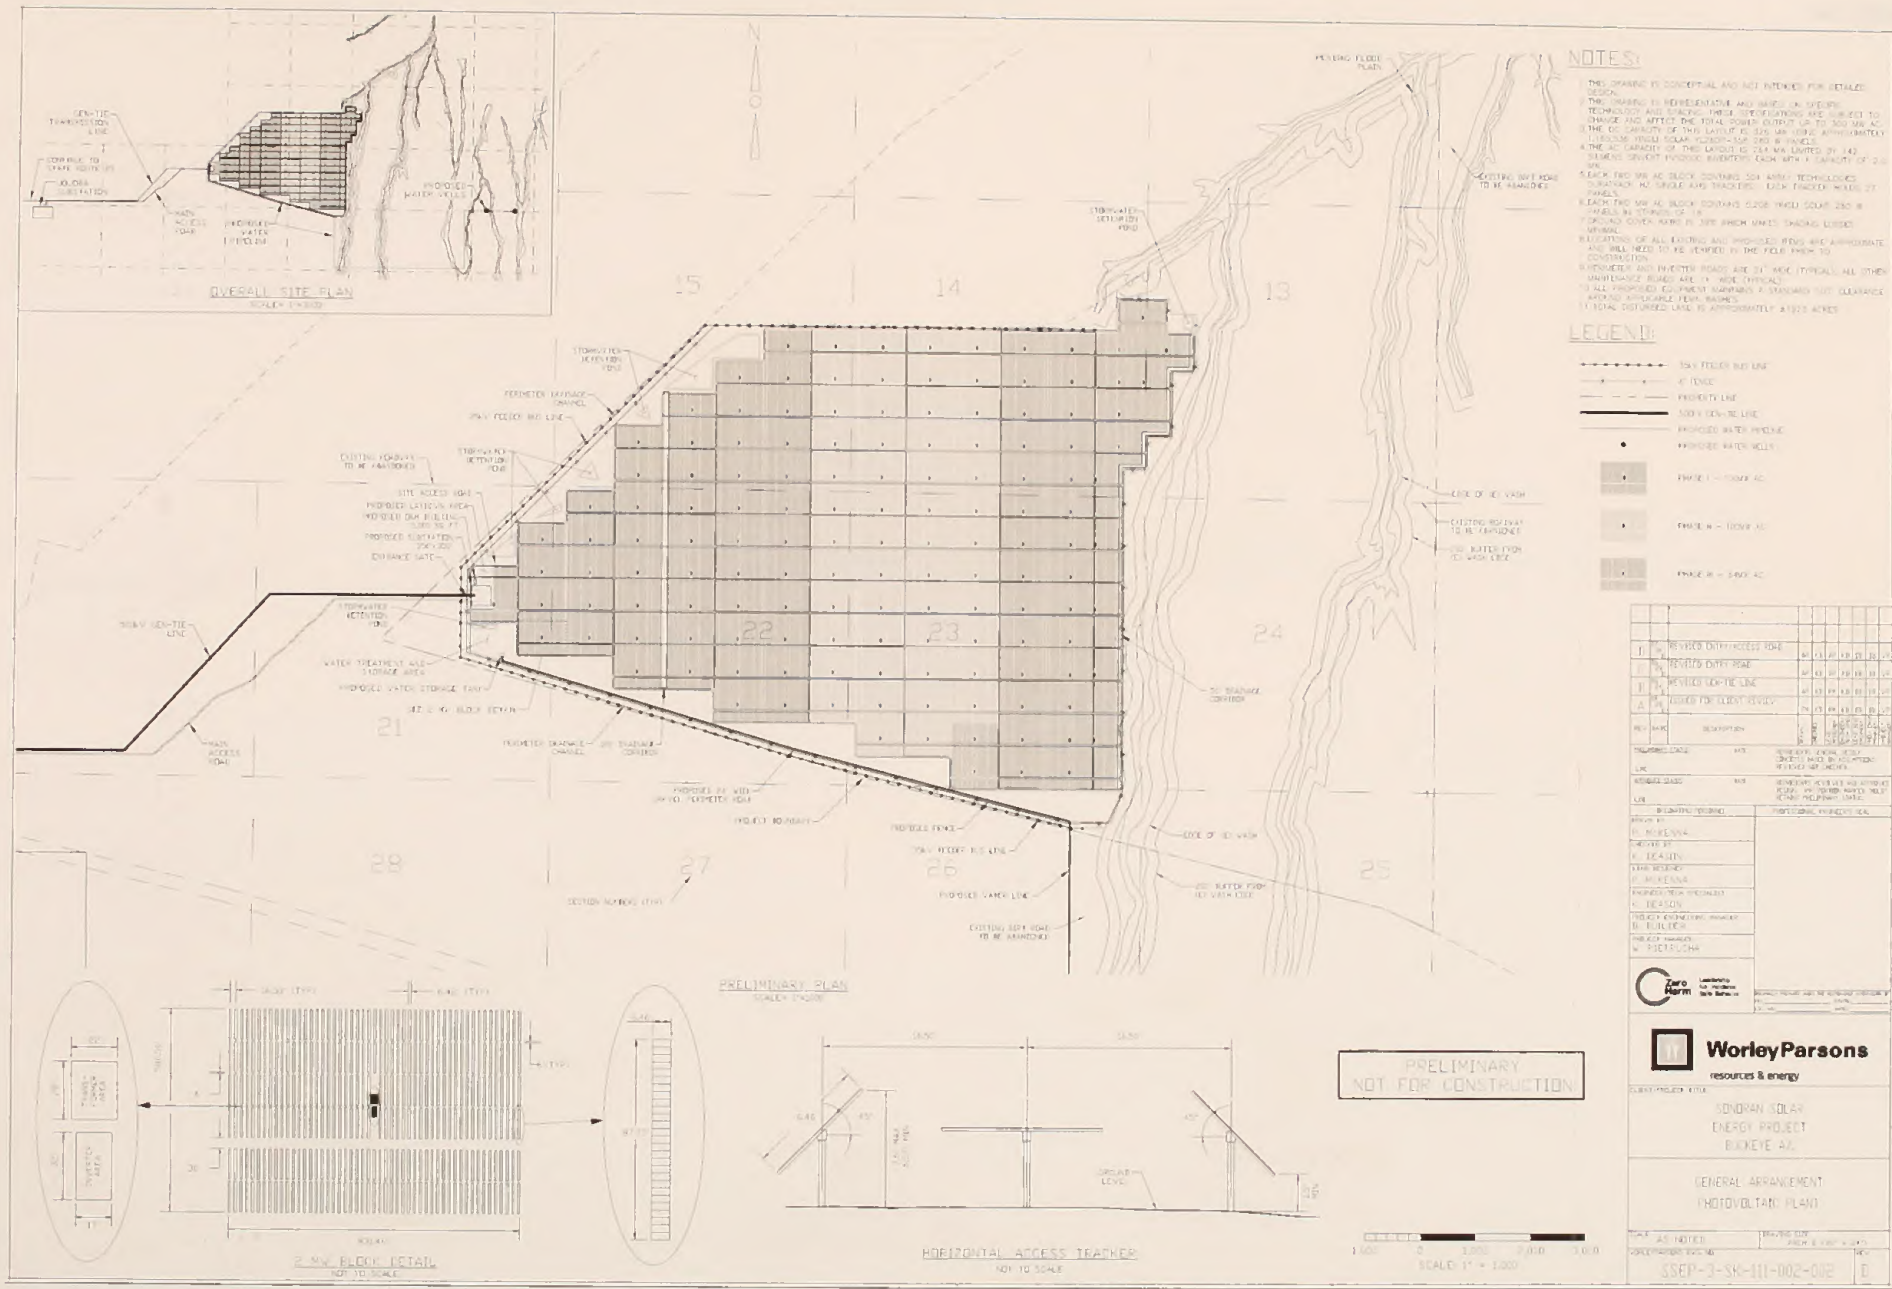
Conceptual site layout under Sub-alternative A1.
